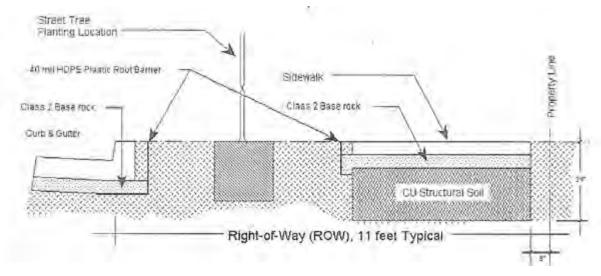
Tree planting diagram for parkway sidewalk construction.
